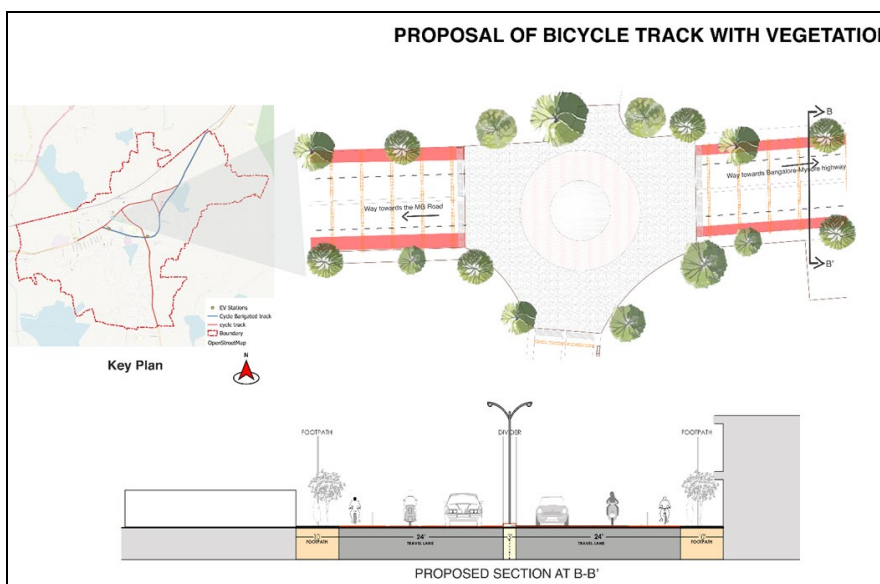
Plan & Section of Proposed Bicycle track, Author Compiled
